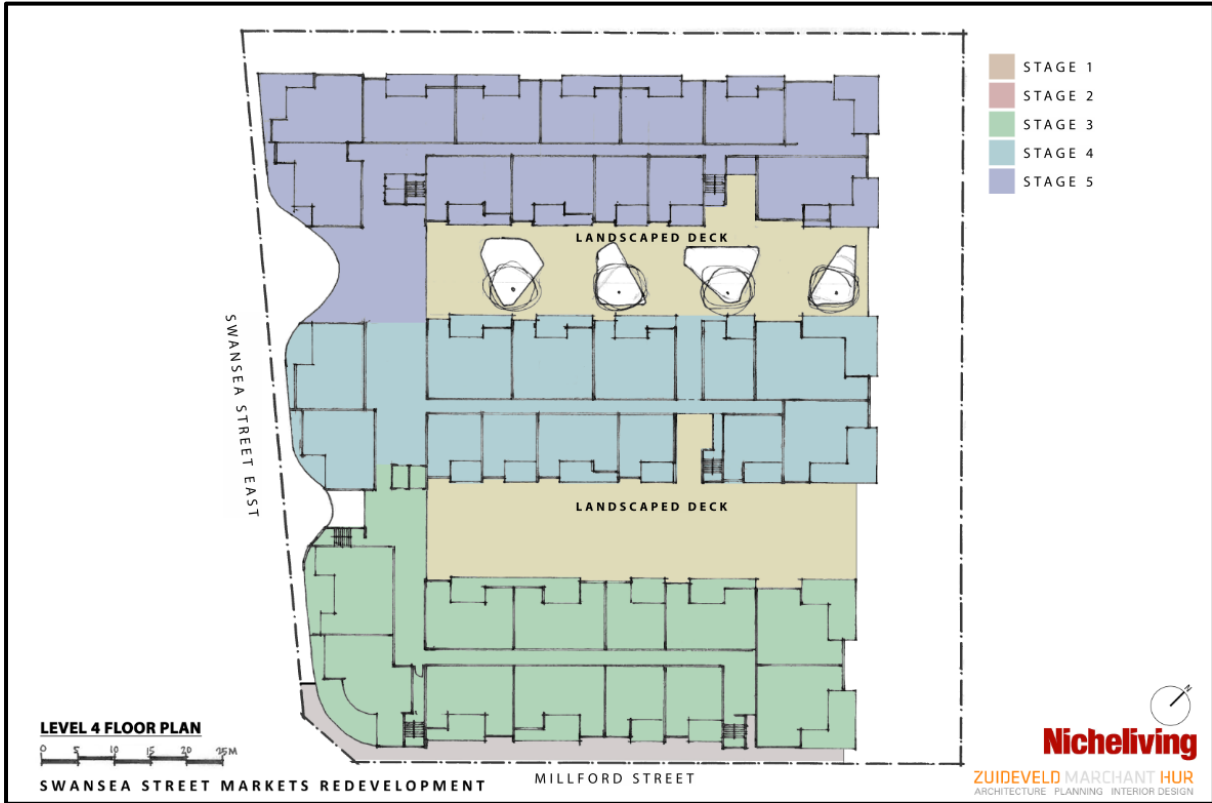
Concept site plan showing indicative apartment layout on the fourth floor
